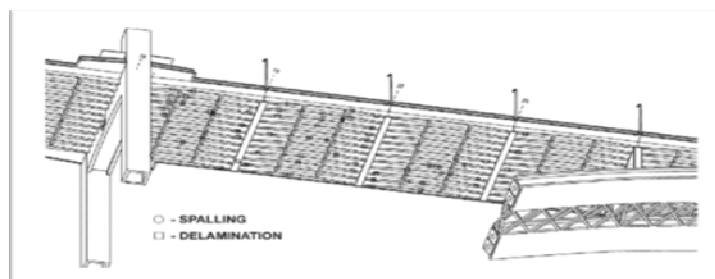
Locations of spalling and delamination under bridge deck (Costa and Appleton; 2002).
